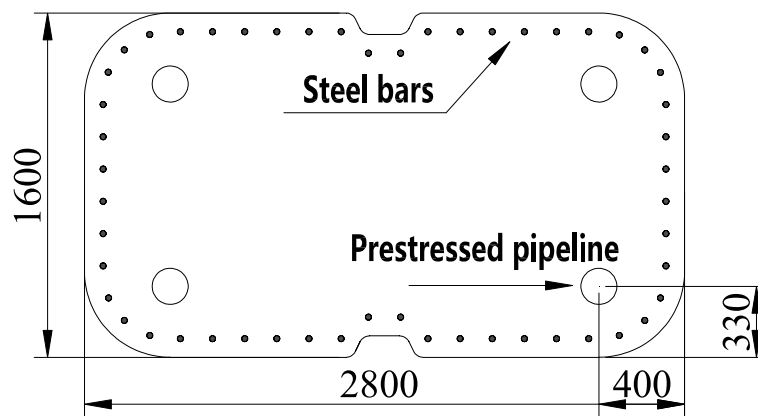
Typical cross-section of a precast assembled bridge pier (unit: mm)
